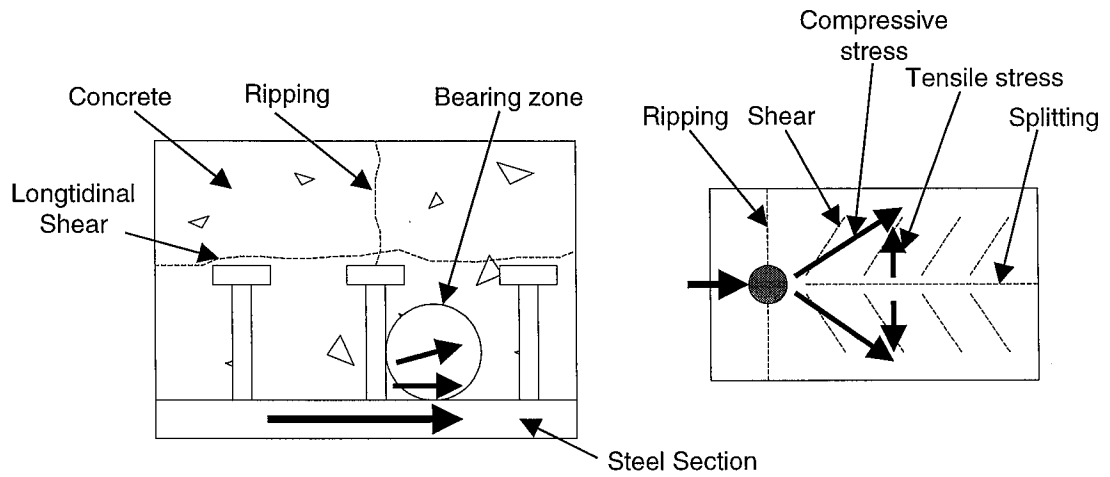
Shear Force Transfer Mechanism of a Headed Stud Connector
